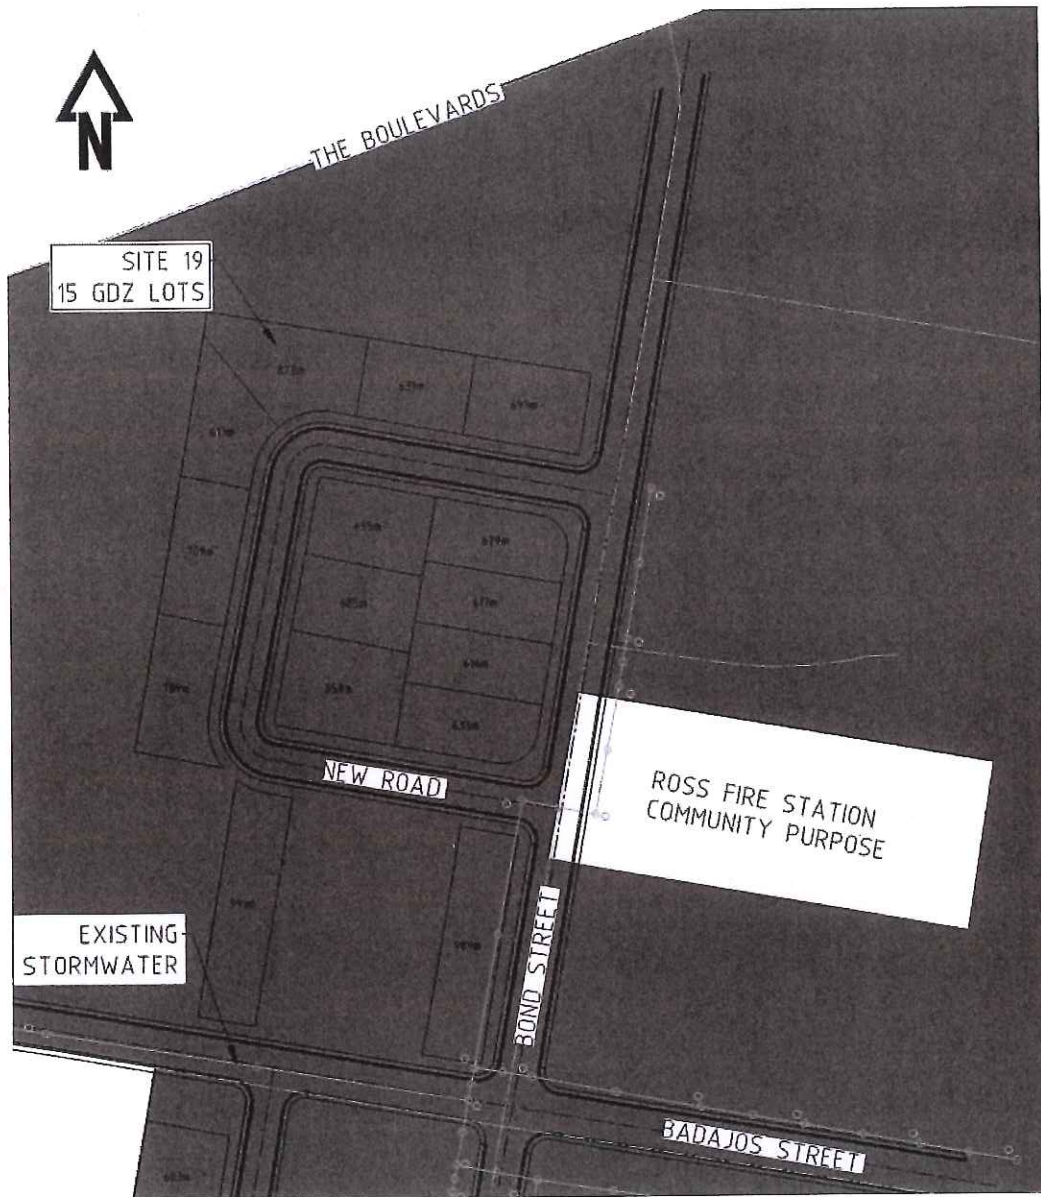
Ross Development Precinct Masterplan off Badajos Street
